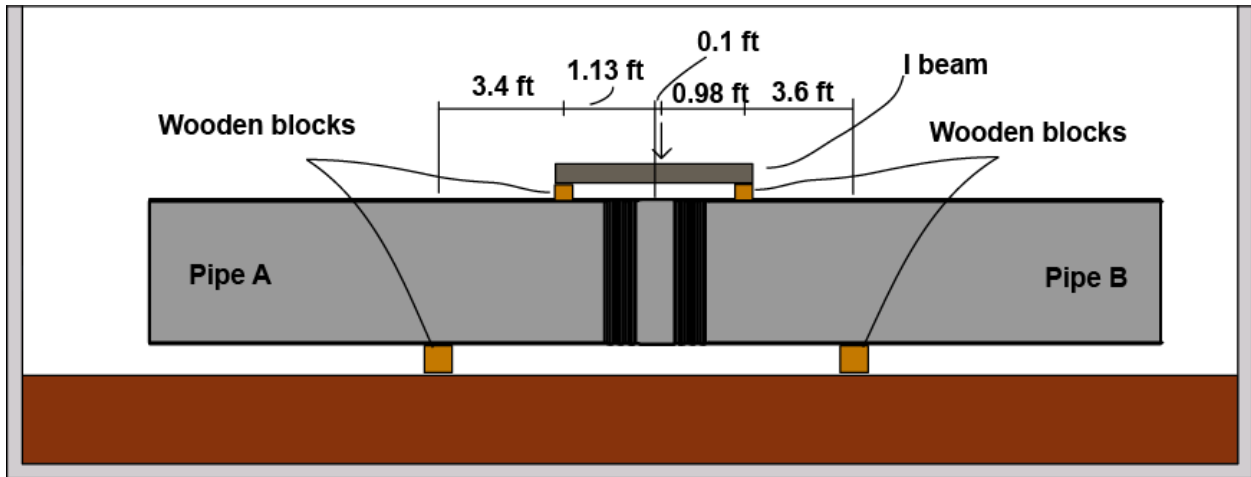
Bending test configuration of the 36 in. (915mm) corrugated steel pipe without gasket.
